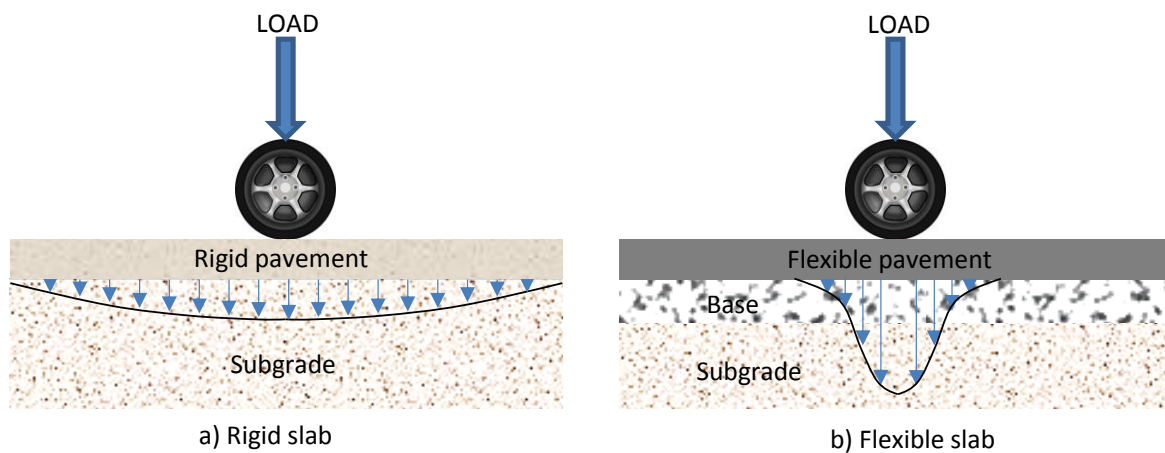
Stress distributions under a) rigid slab and b) flexible slab (after Muench 2006)
